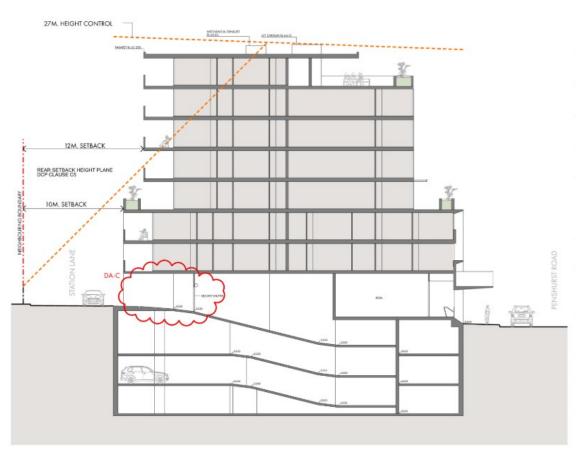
Building Height Plane. Source: Architectural Plans Revision DA.C
